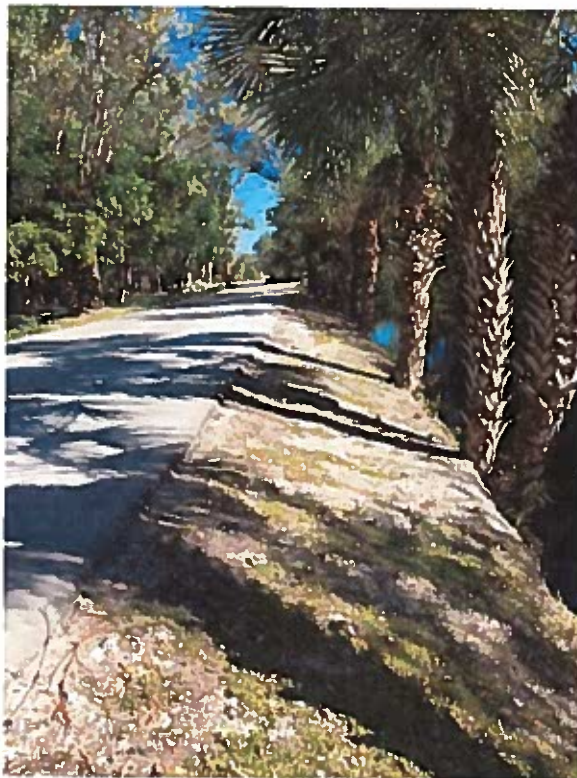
Photo of canal bank along the east side of existing paved area to be stabilized.
